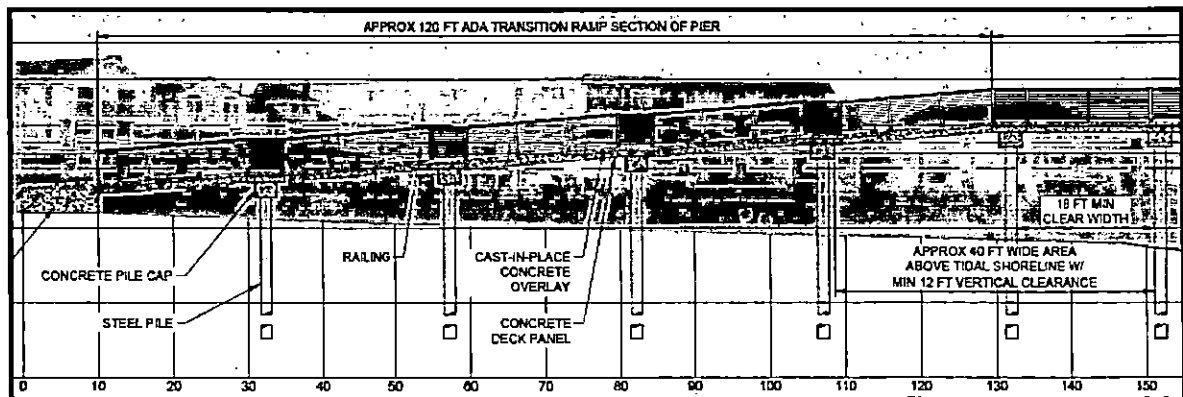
Proposed Precast Concrete Pier Profile Off Seawall
